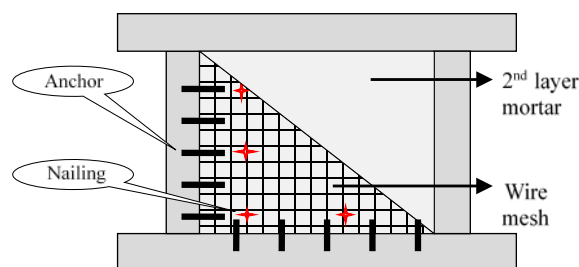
Illustration of Ferro-cement laminated on masonry infilled RC frame
